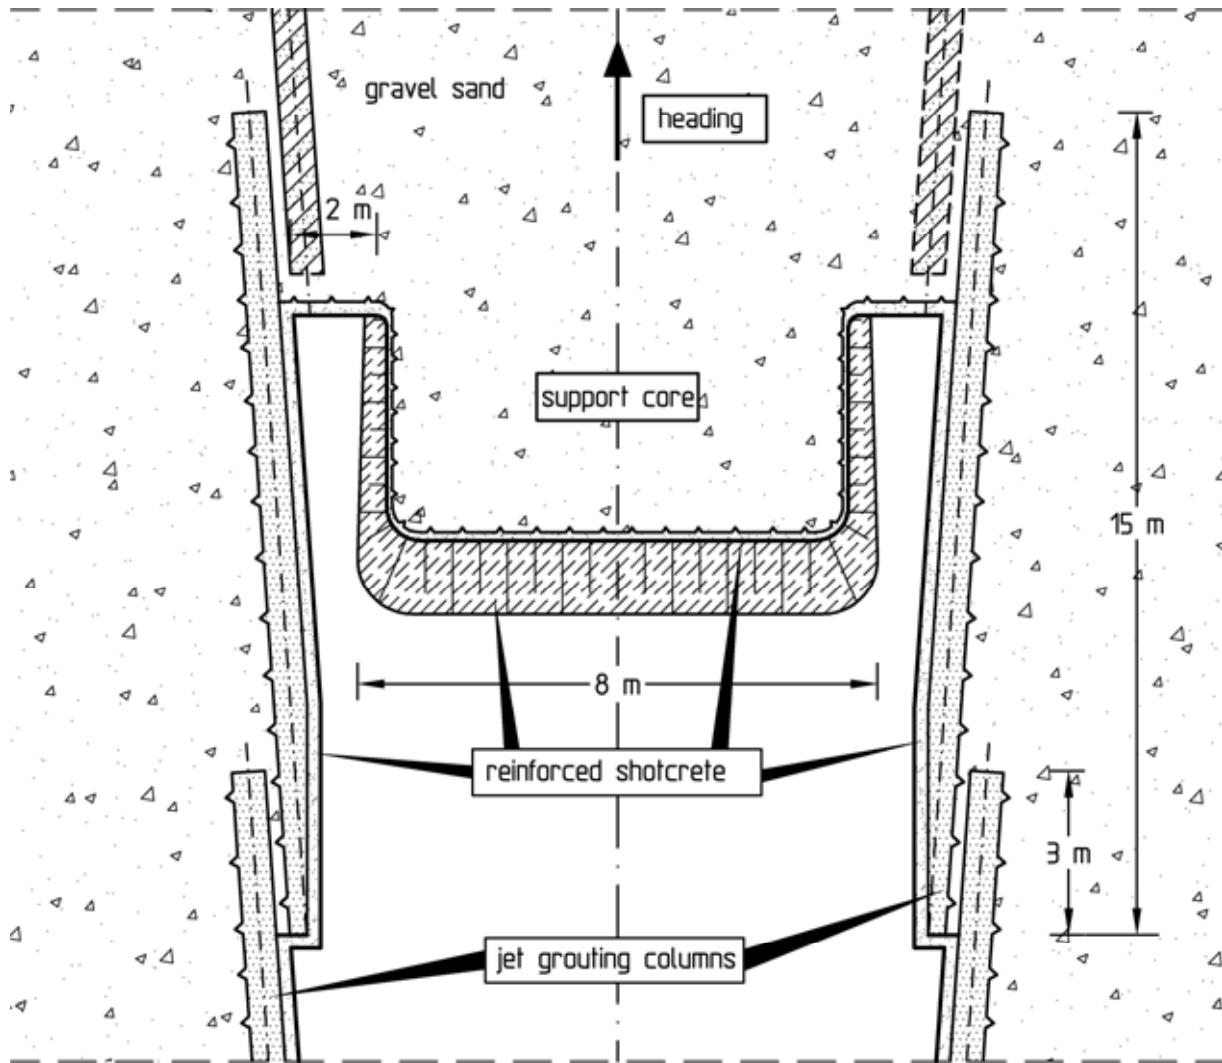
Heading of the two-lane tunnels, excavation and support, plan view (section I-I, see Fig. 7.8)
